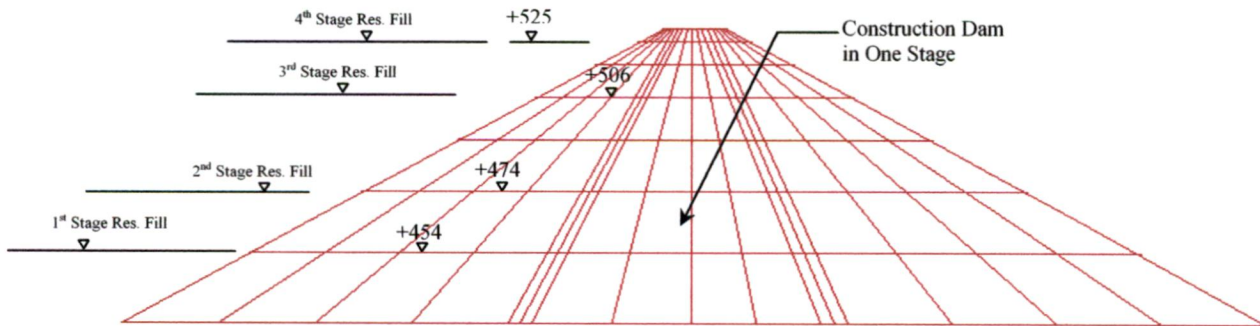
(b). One Stage of Construction Dam and Four Stages Reservoir Filling
